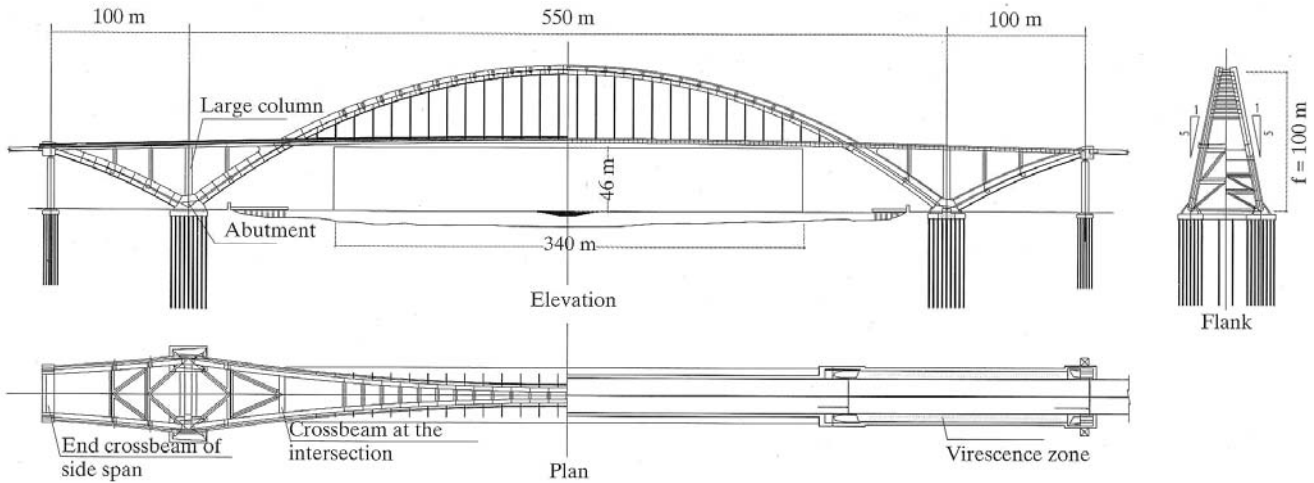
General arrangement of the Shanghai Lupu Bridge (Dimensions in m)
